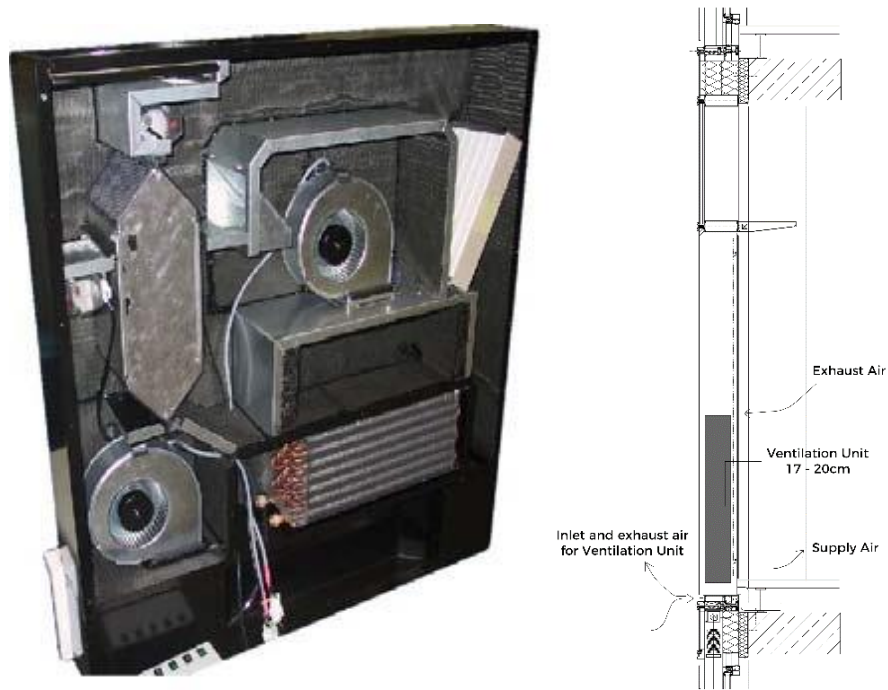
Photo of the ventilation unit (Left) and an architectural facade section drawing (Right).
